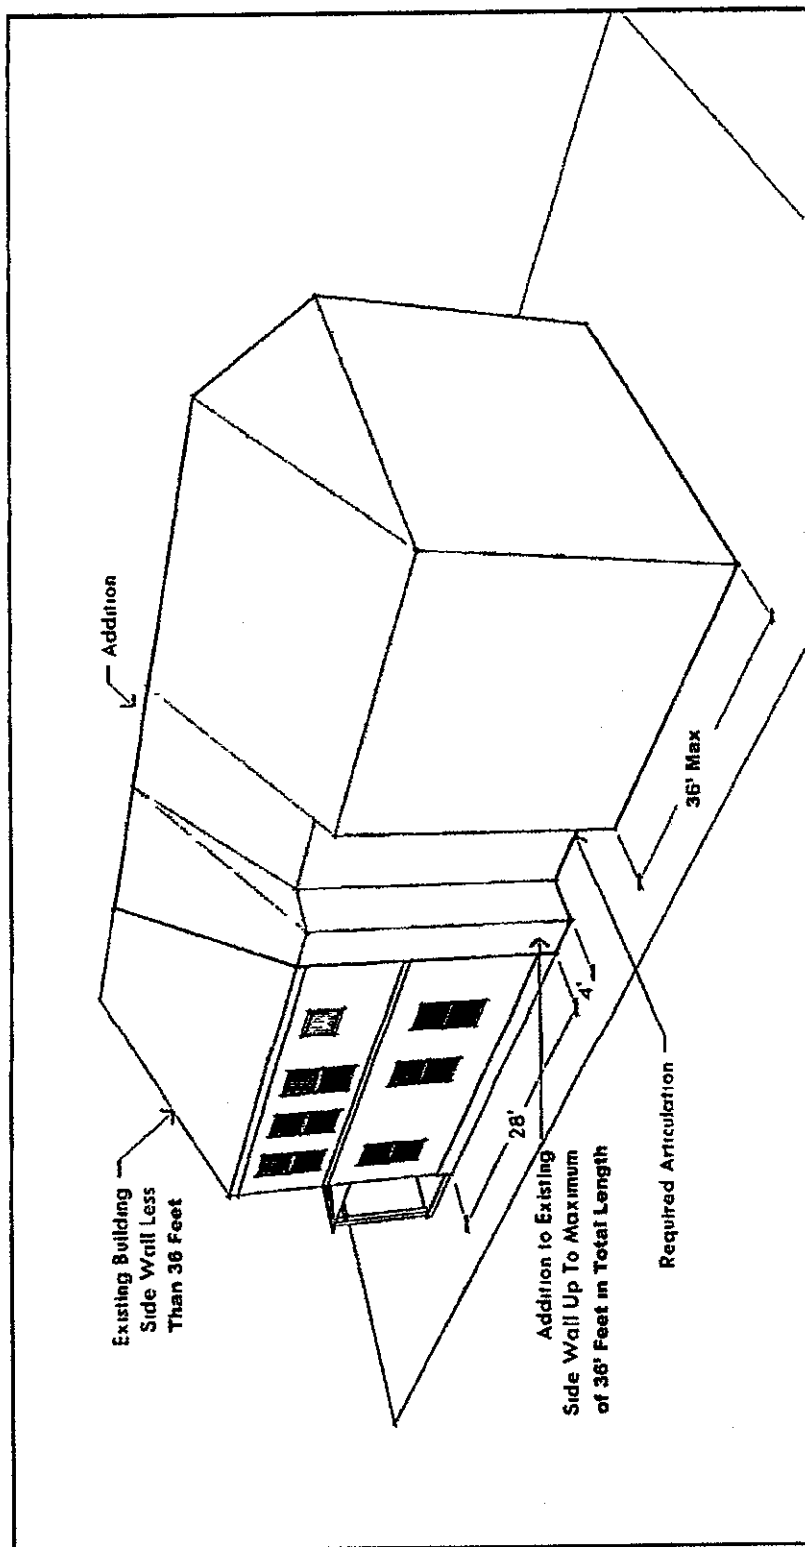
Side Setback Plane Exception for Existing Single-Story Buildings
